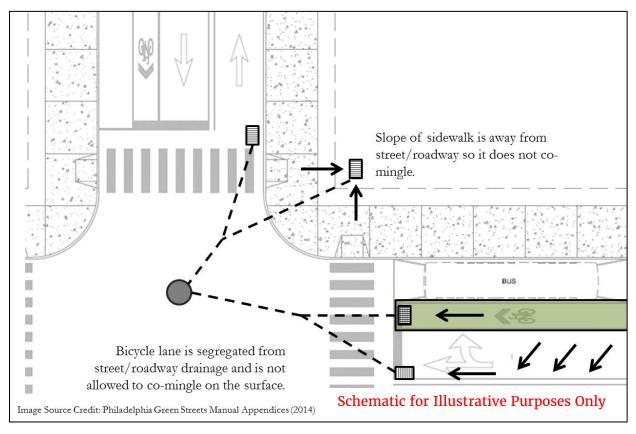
Schematic showing hydraulic disconnection of sidewalks and bicycle lanes in a typical intersection.
